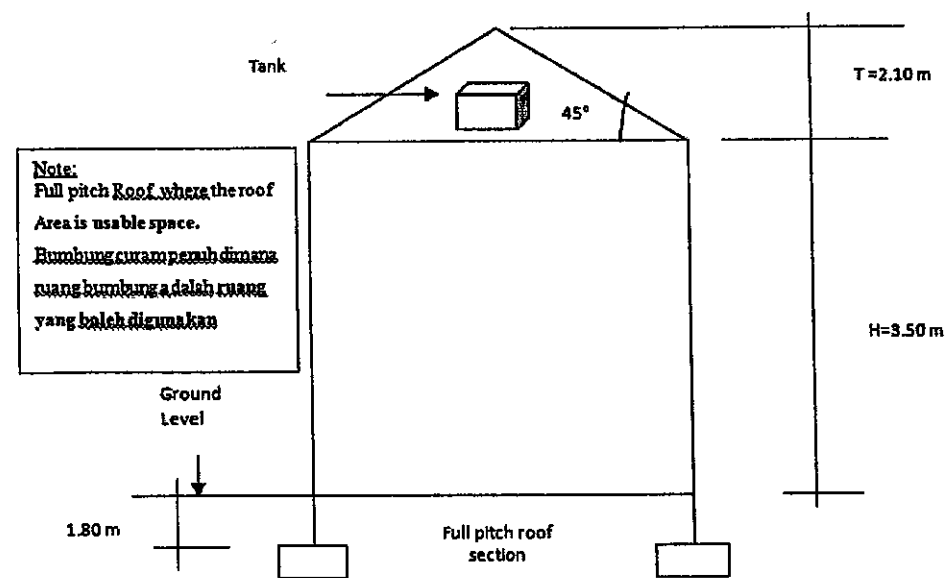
(b): Cross Section /Rajah B1(a): Keratan
